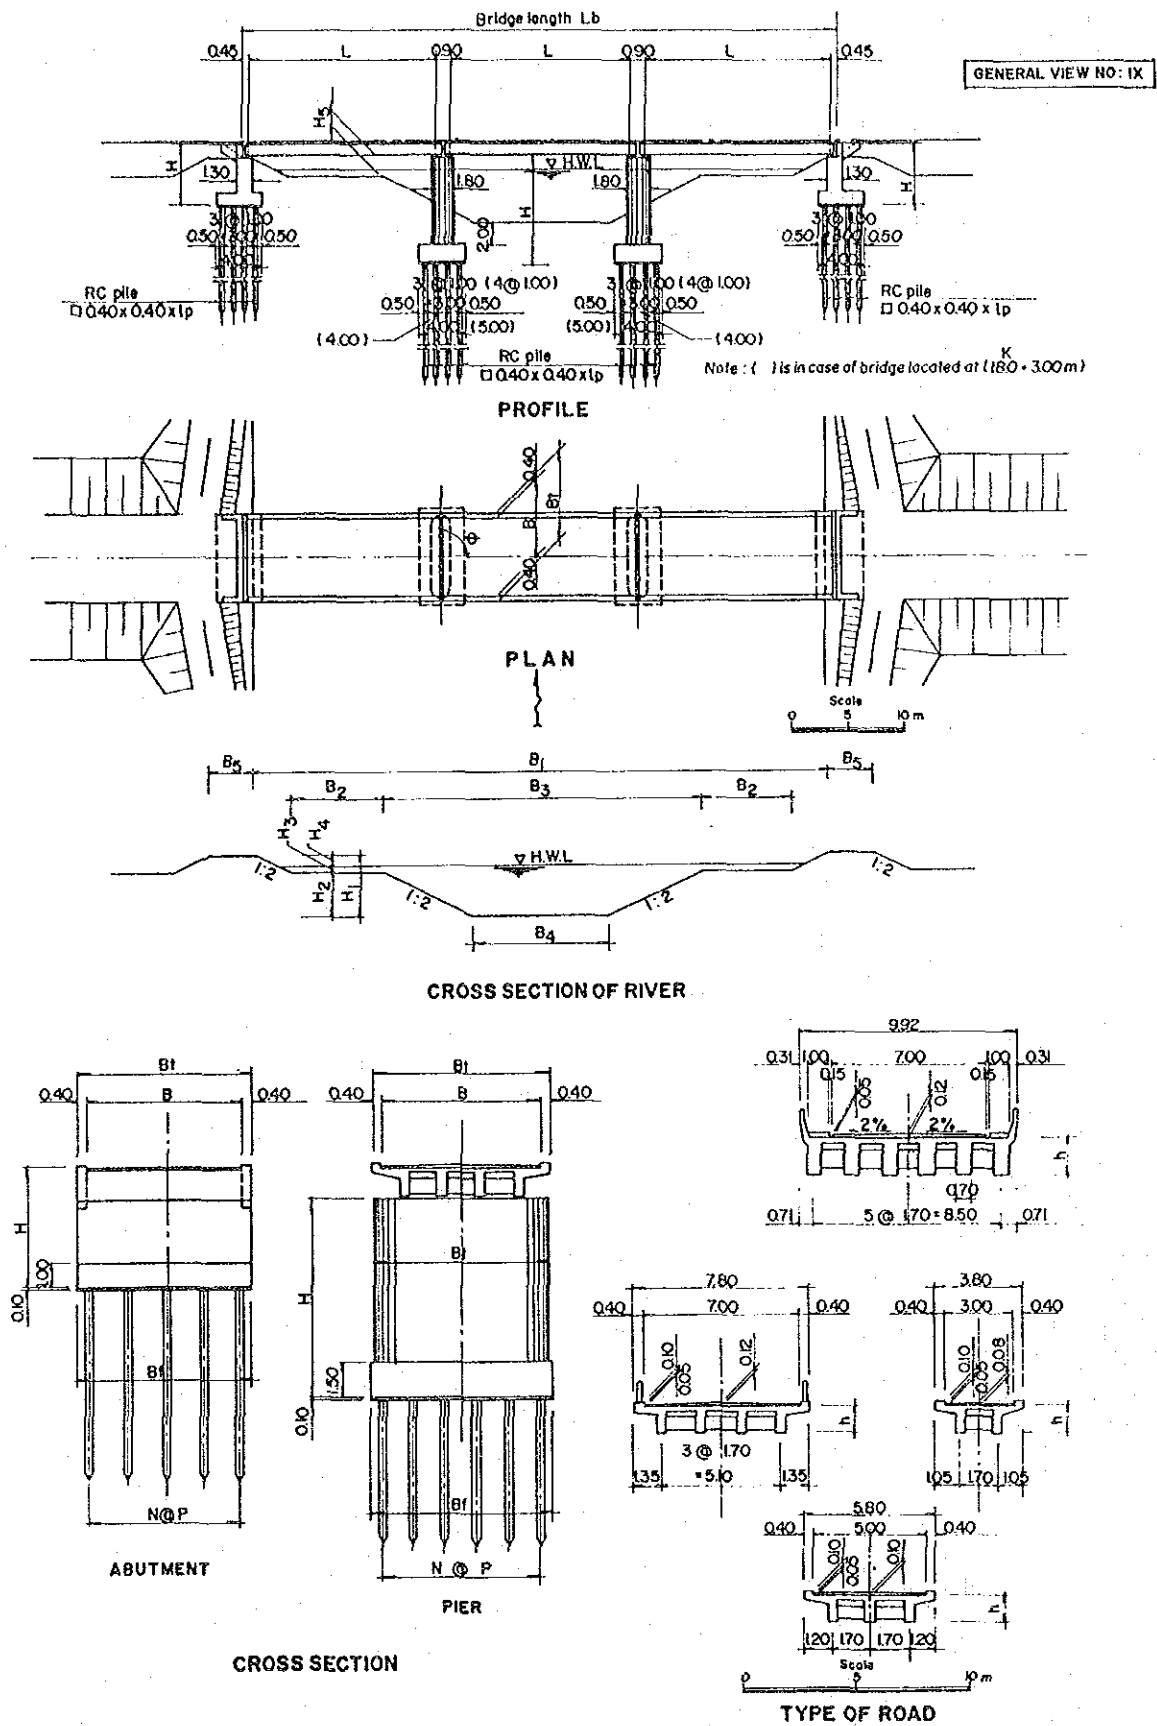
STANDARD DESIGN OF BRIDGE (4/4)
